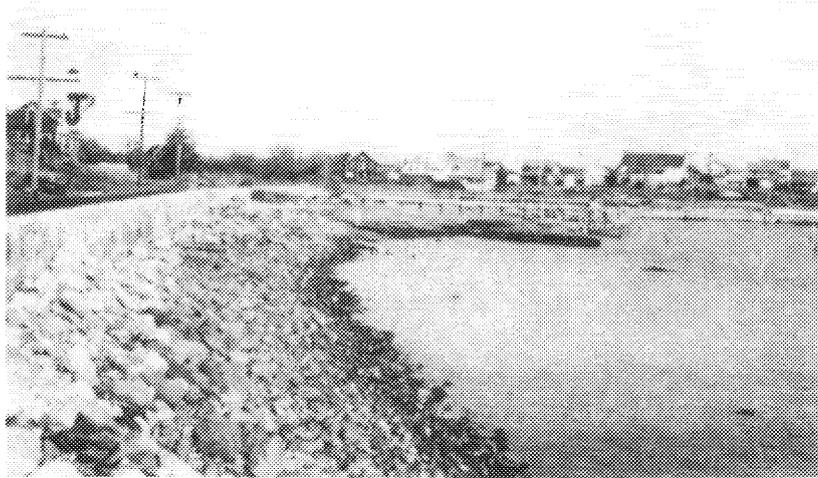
LORDS POINT, STONINGTON. Oct. 28, 1947. Riprap and sea wall protect shore road along west side of cove.
